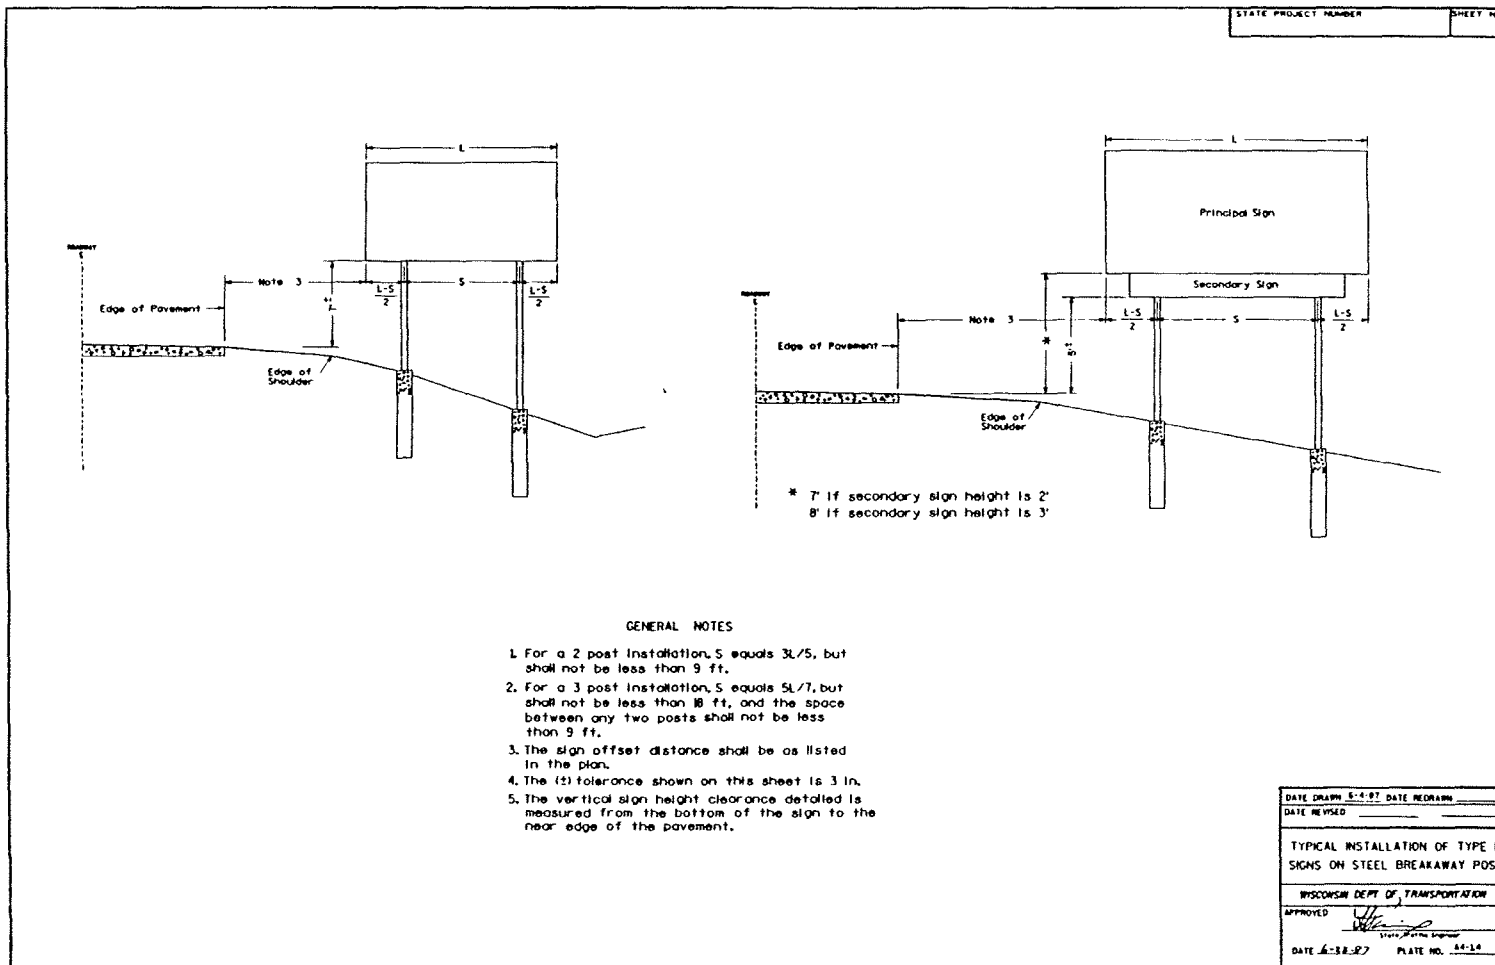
Typical installation, Type 1 signs on steel breakaway posts, test nos. 5 through 8.
